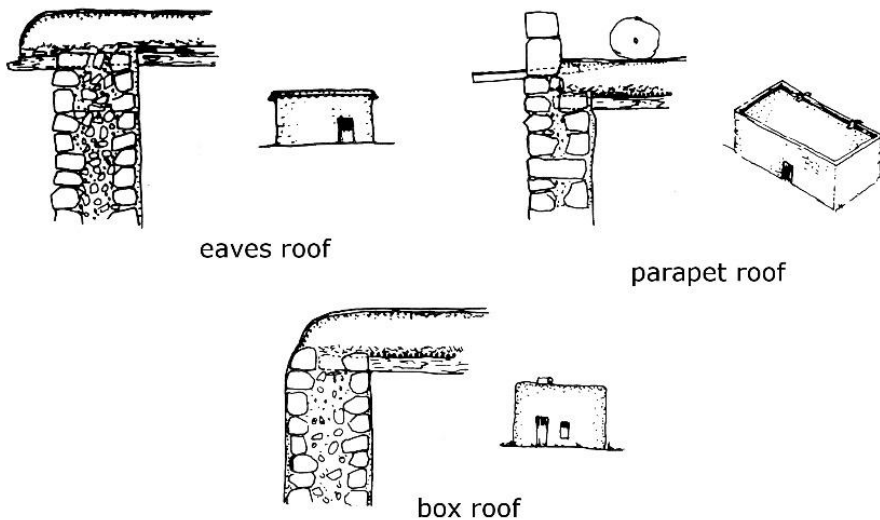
Three common roof types: eaves roof, parapet roof and box roof. The examples show dry stone walls, but the principle of loam terrace roof construction is the same (after Wright, 1985, fig. 363).
